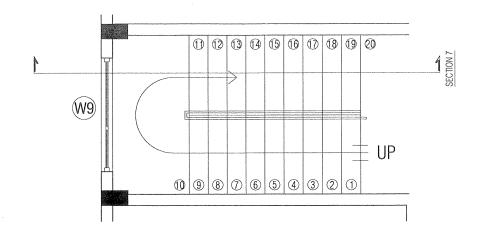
DETAILED DESIGN, ARCHITECTURAL DRAWINGS
